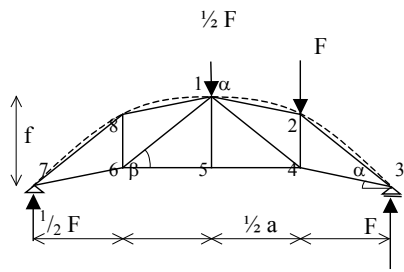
Trussed vault subjected to an asymmetrically loading
